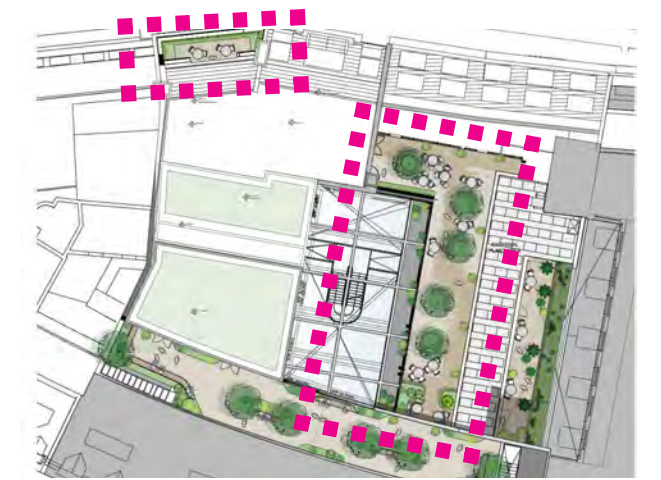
FLOOR 6 ENCLOSED TERRACE SOFT LANDSCAPE PLAN
